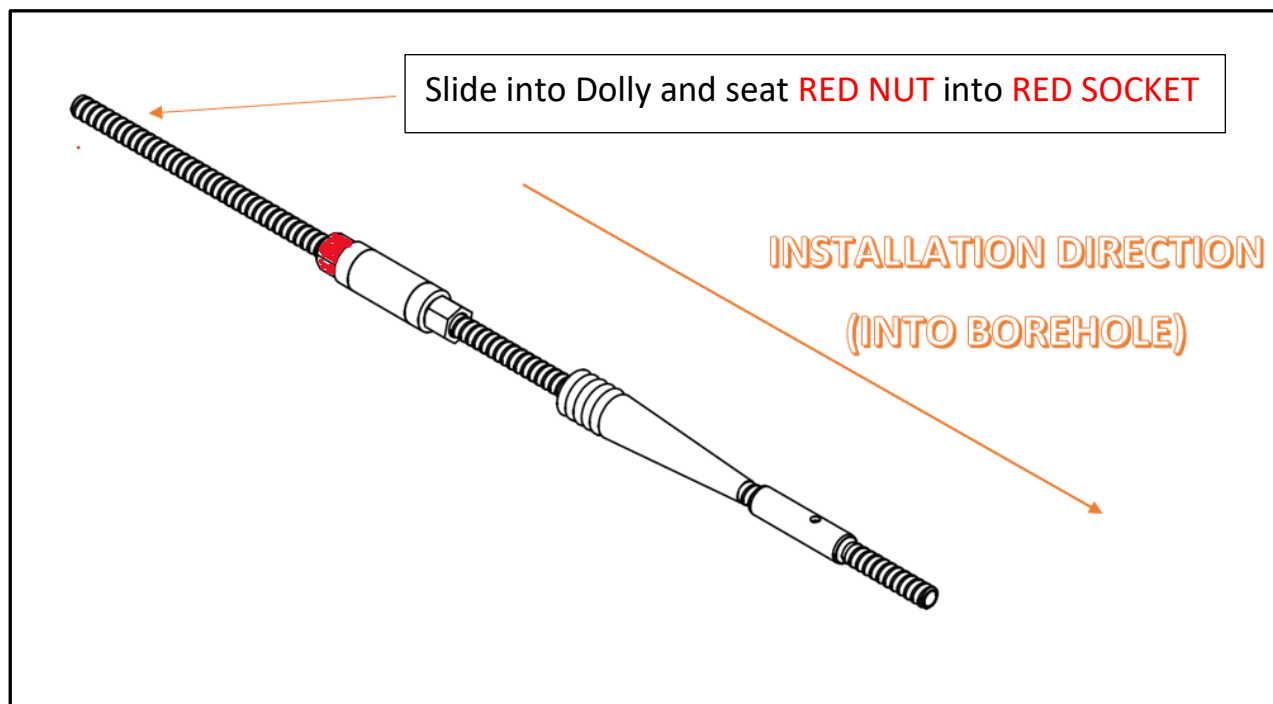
MINERIGHT PACKER (ASSEMBLED)
